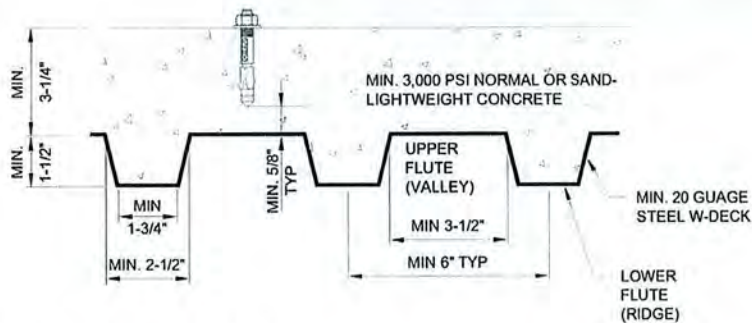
C—INSTALLATION ON THE TOP OF CONCRETE OVER METAL DECK FLOOR AND ROOF ASSEMBLIES^{1,2}
